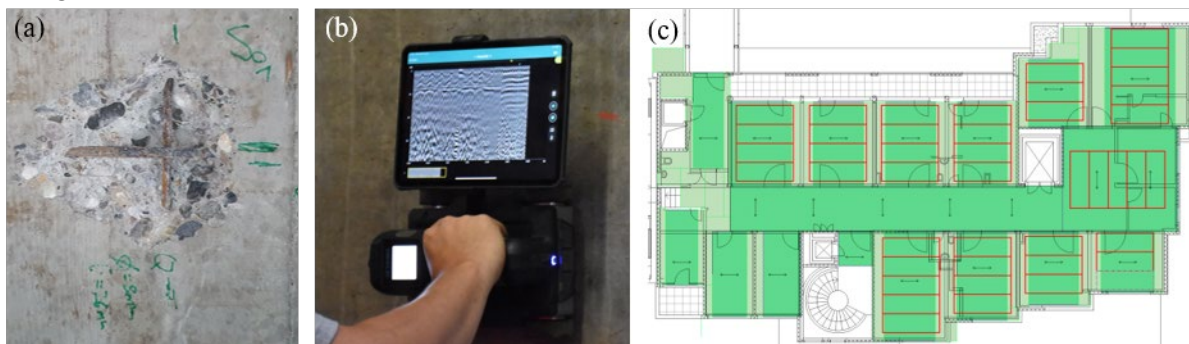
Obsolete structure audit for the second case study: (a) destructive openings in the concrete cover, (b) GPR investigation, and (c) floor plan with varying bending resistances (light and dark green) and sawing layout (red)
